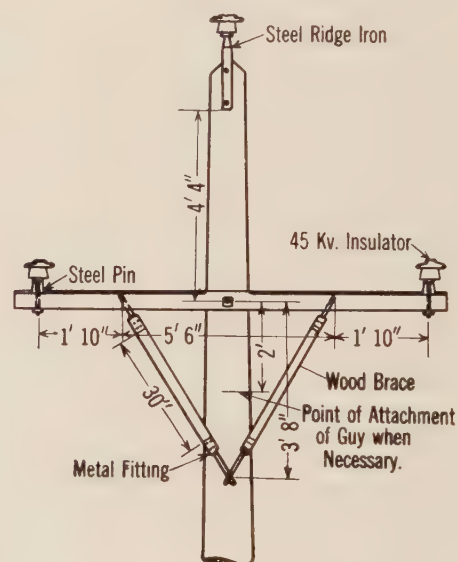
NEW DESIGN, 33,000-VOLT WOOD POLE CONSTRUCTION
